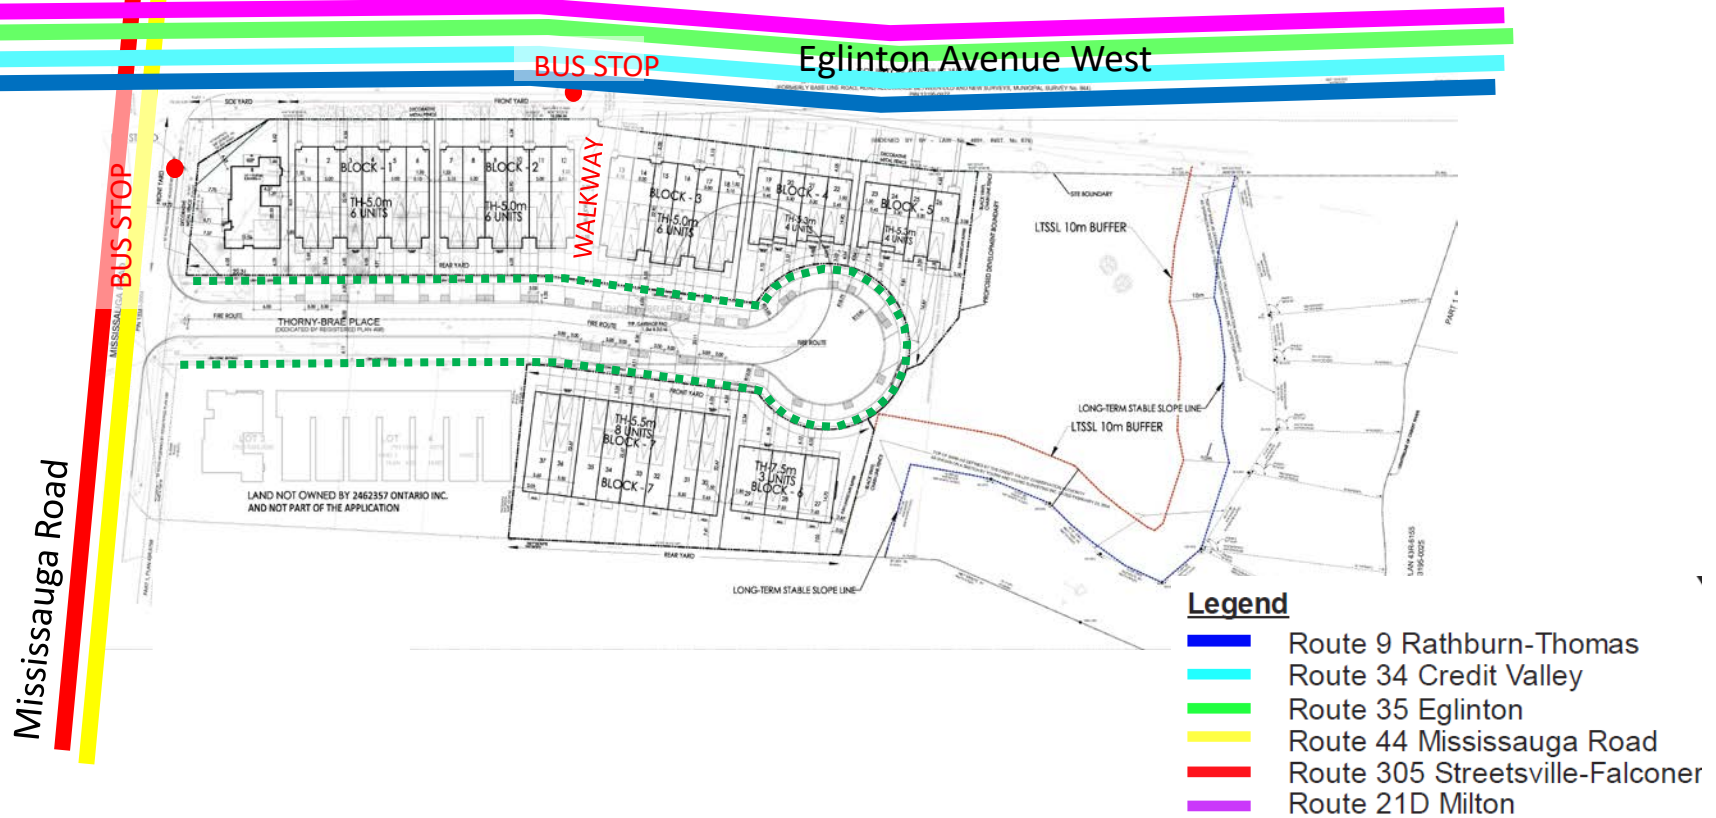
Proposed Draft Plan of Subdivision and Thorny Brae Place R.O.W (March 14, 2019)
